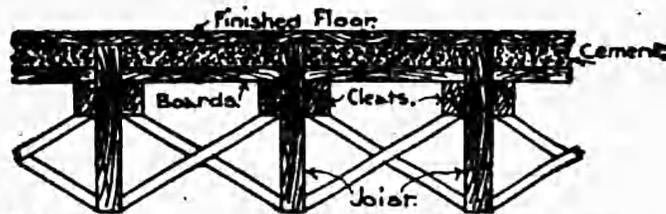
Floor with wooden joists and a thin layer of cement.
